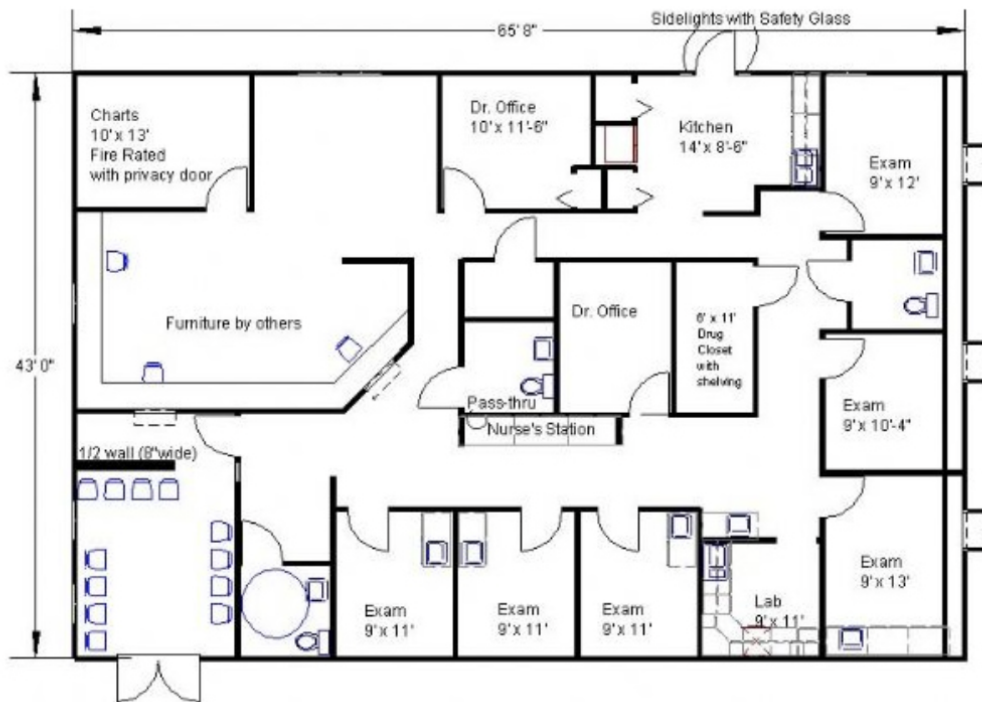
Example from <https://rosemedicalbuildings.com/floor-plan-category/medical-healthcare-buildings/>
